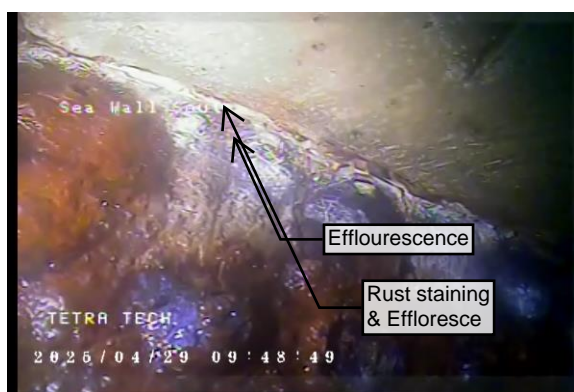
Sheet pile corrosion and efflorescence
